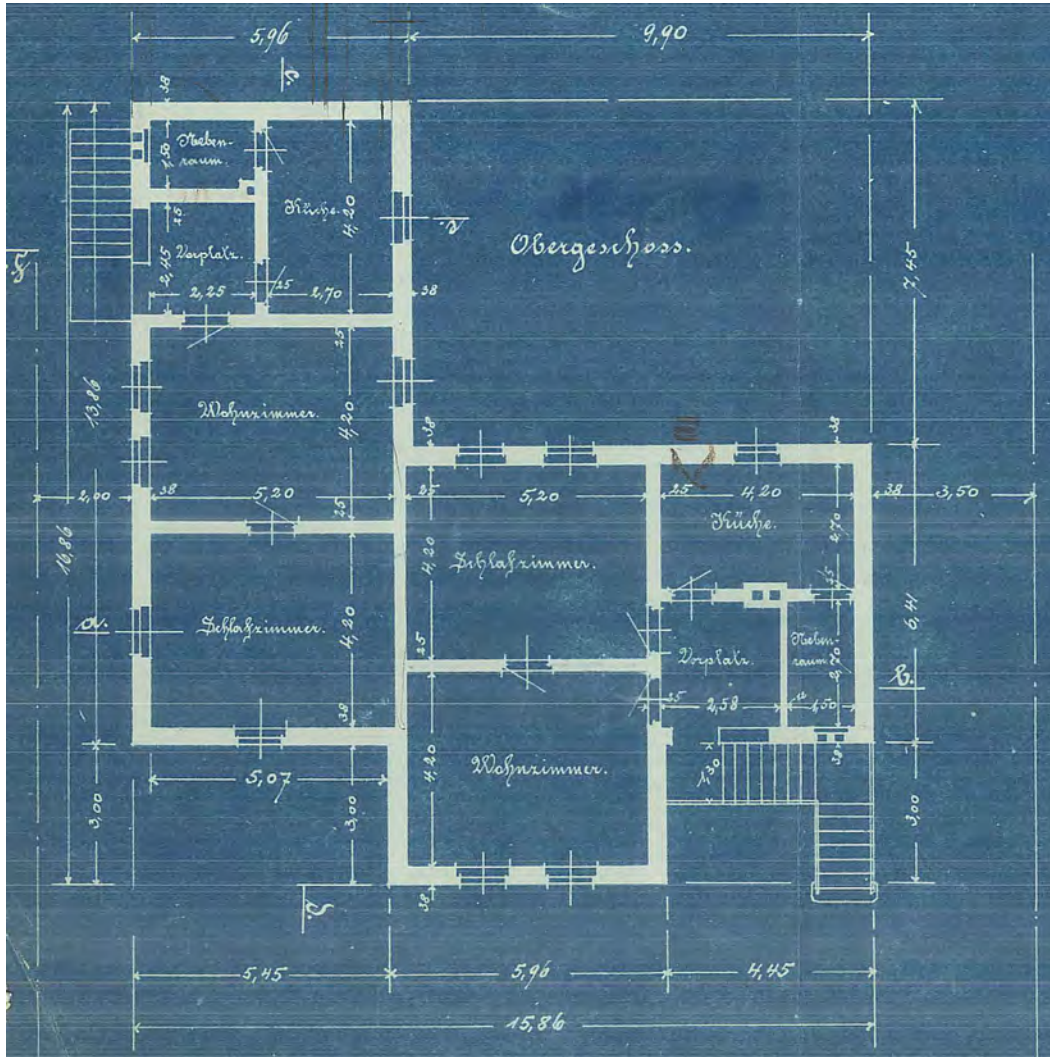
House m Floor Plan Option B, July 1909. NAN: Plan No. 1700.
